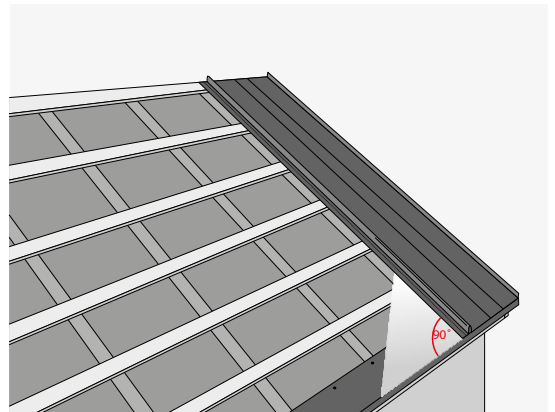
SETTING THE RIGHT ANGLE ON THE ROOF PLANE
